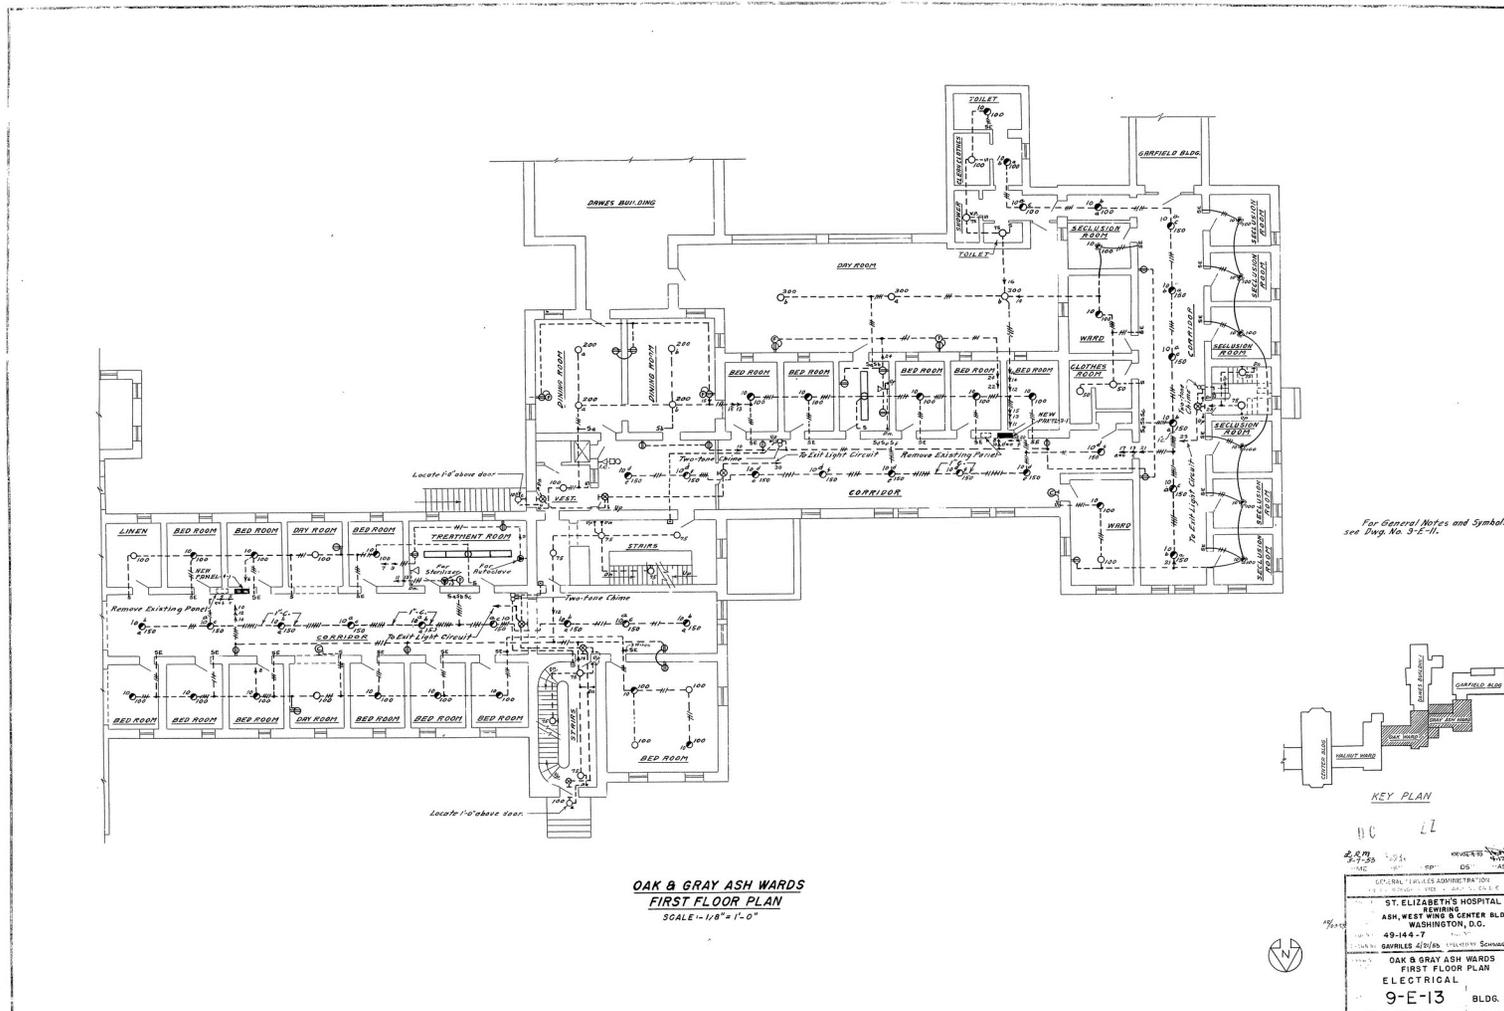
First floor plan of the West Wing, Oak and Gray Ash wards, outlining improvements to the electrical system, 1953. Source: GSA archives, image DC0070SE0005.
